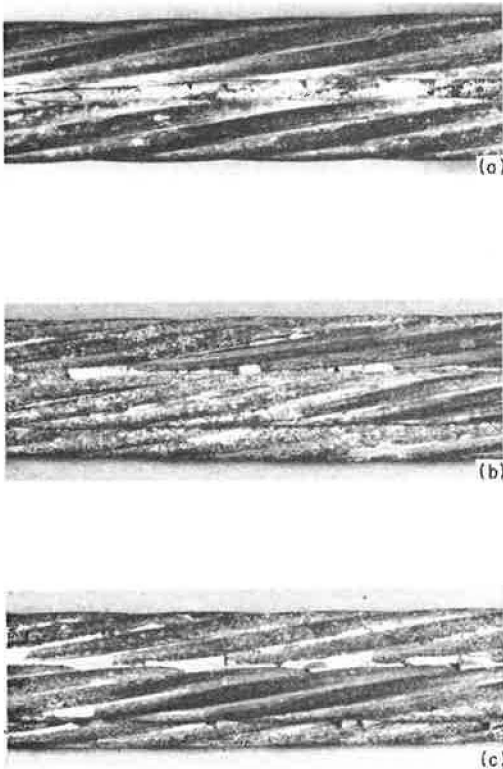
Condition of strands: (a) Case I, ungrouted tendon; (b) Case II, grouted tendon—initial crack; and (c) Case III, grouted tendon—no crack.
